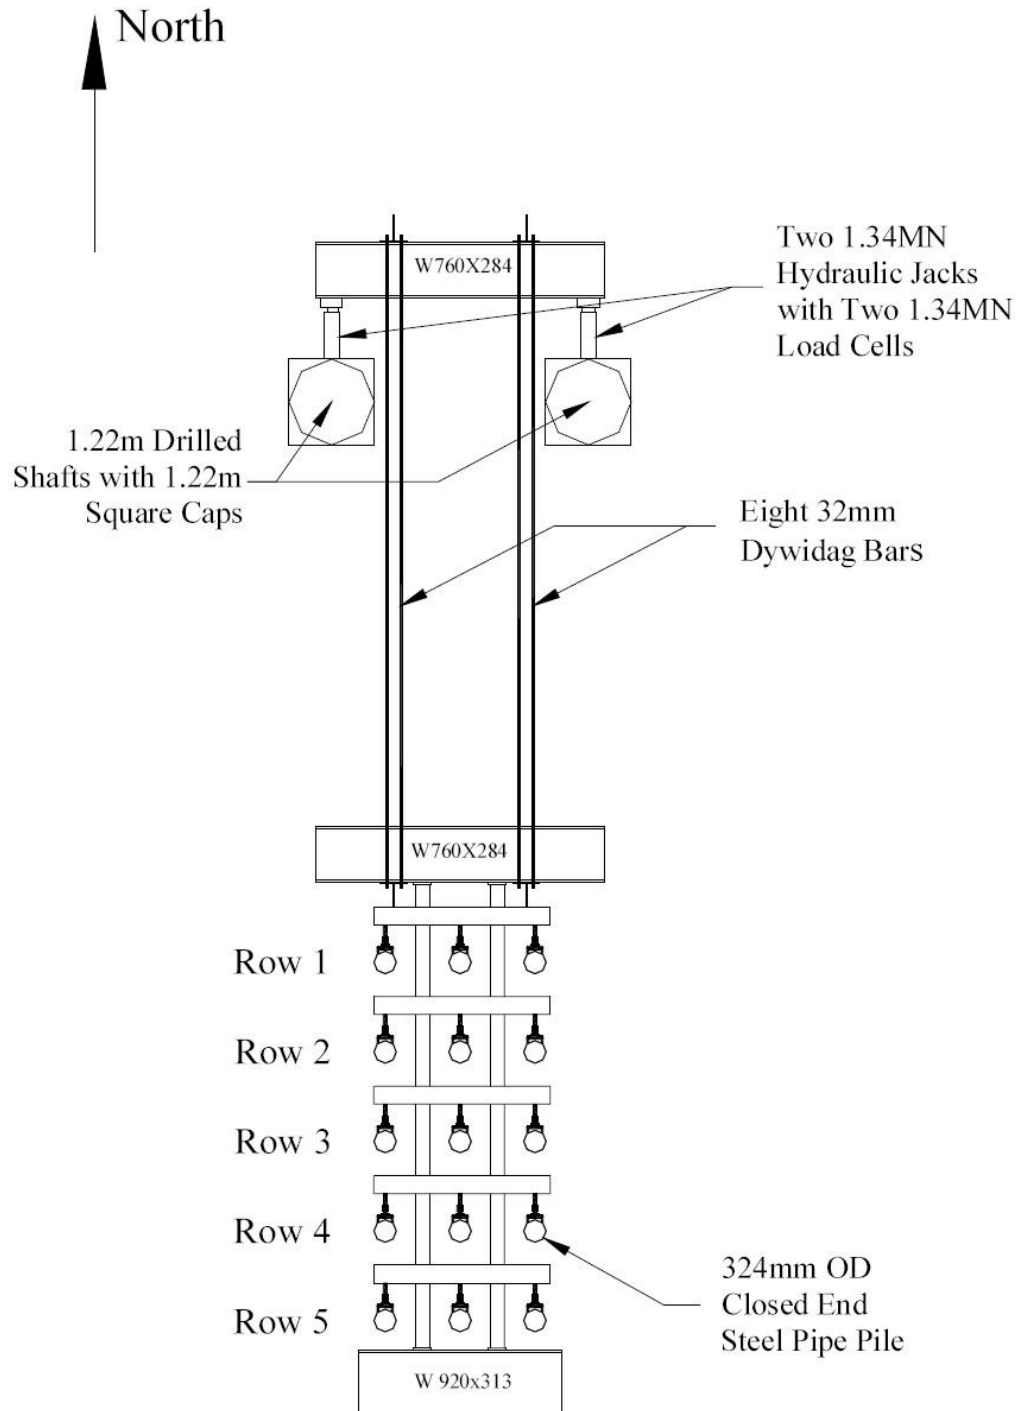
is a plan view of the test site and diagrams the locations of the 15-pile group, its companion single pile, and the drilled shafts used as a reaction foundation.
